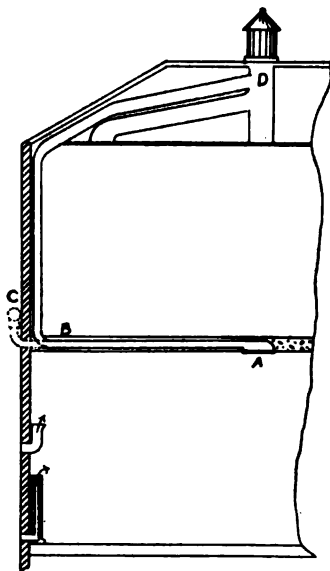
Natural Ventilation of Two-storeyed Building.
